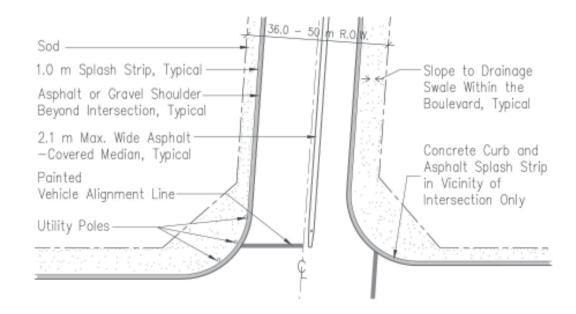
g- Plan of Arterial Intersection (Rural Road Section)
